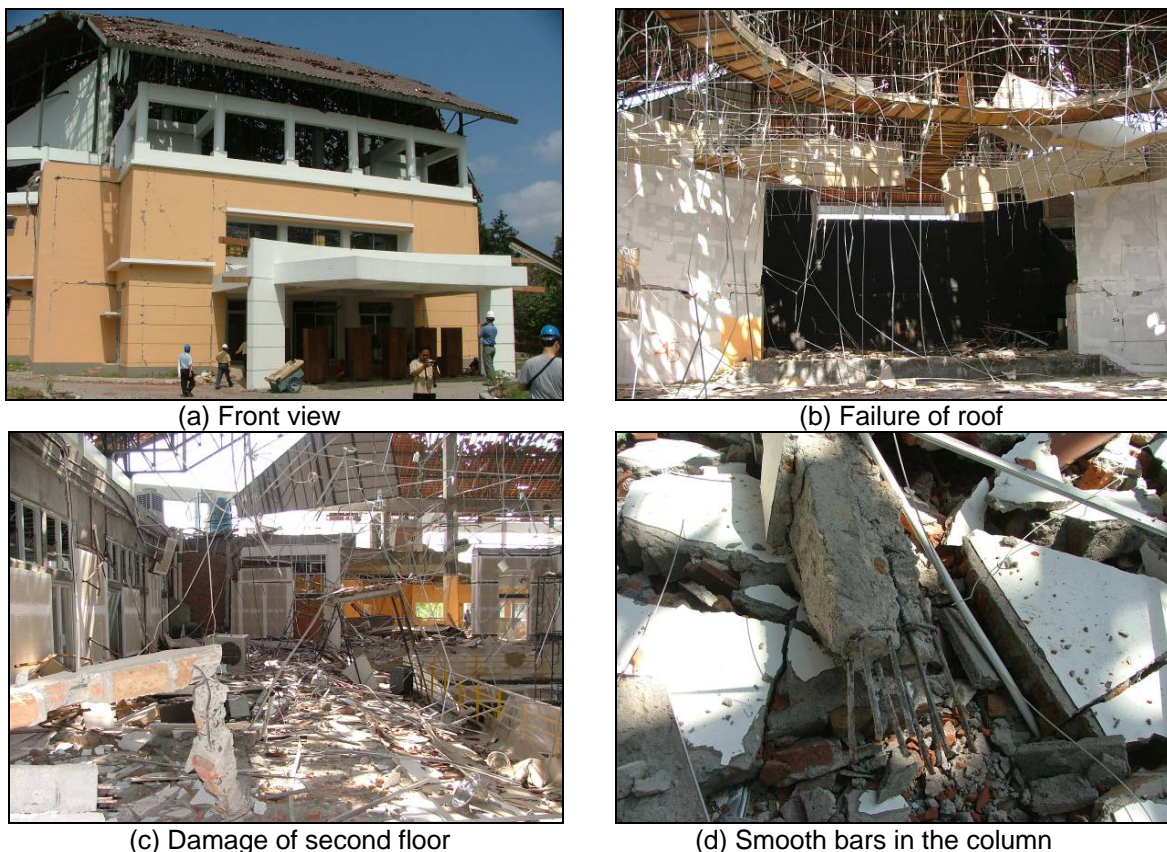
Damage of Multipurpose Building, UIN (S7° 47.162' -E110° 23.574')
